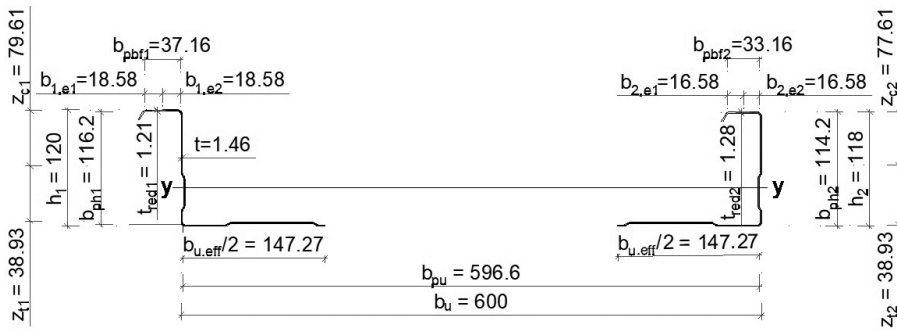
Effective cross section of the narrow flange under compression and the entire cross sections of the webs of a 600/120 wall cassette
